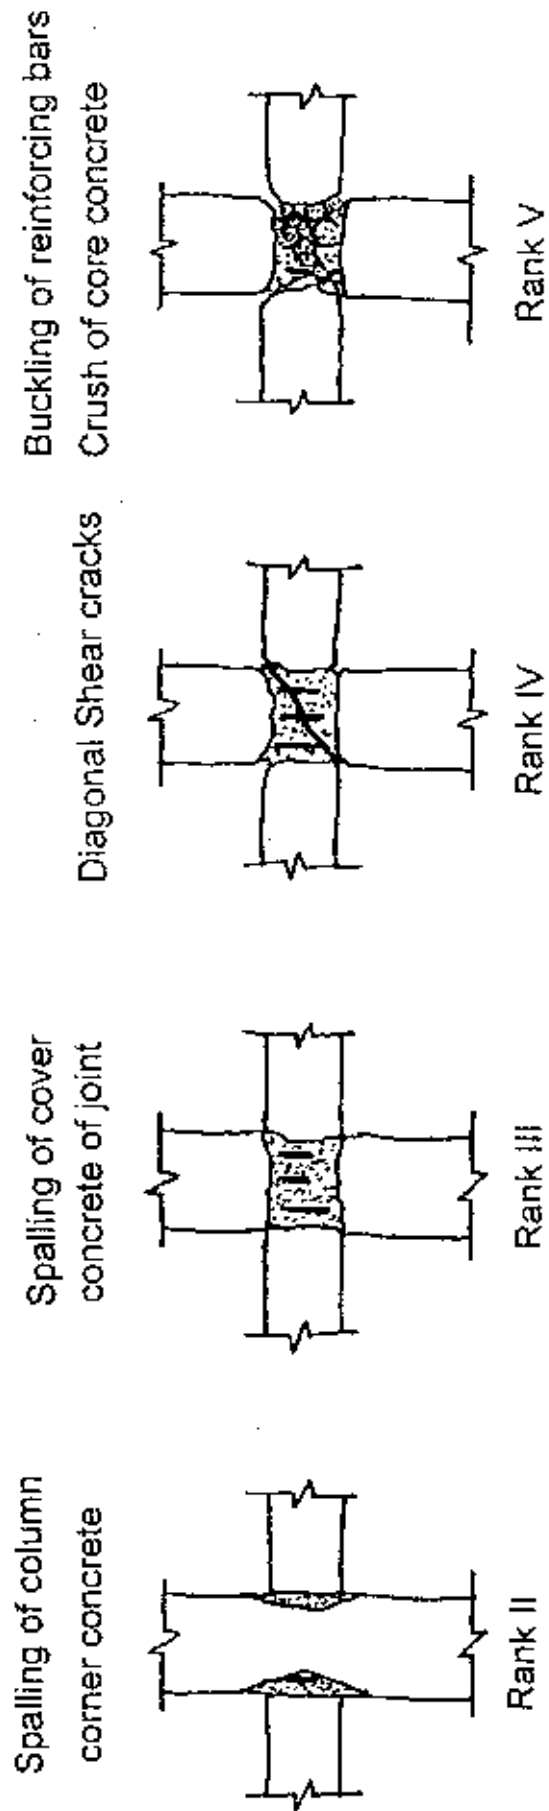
Damage Rank of Beam-Column Joints
